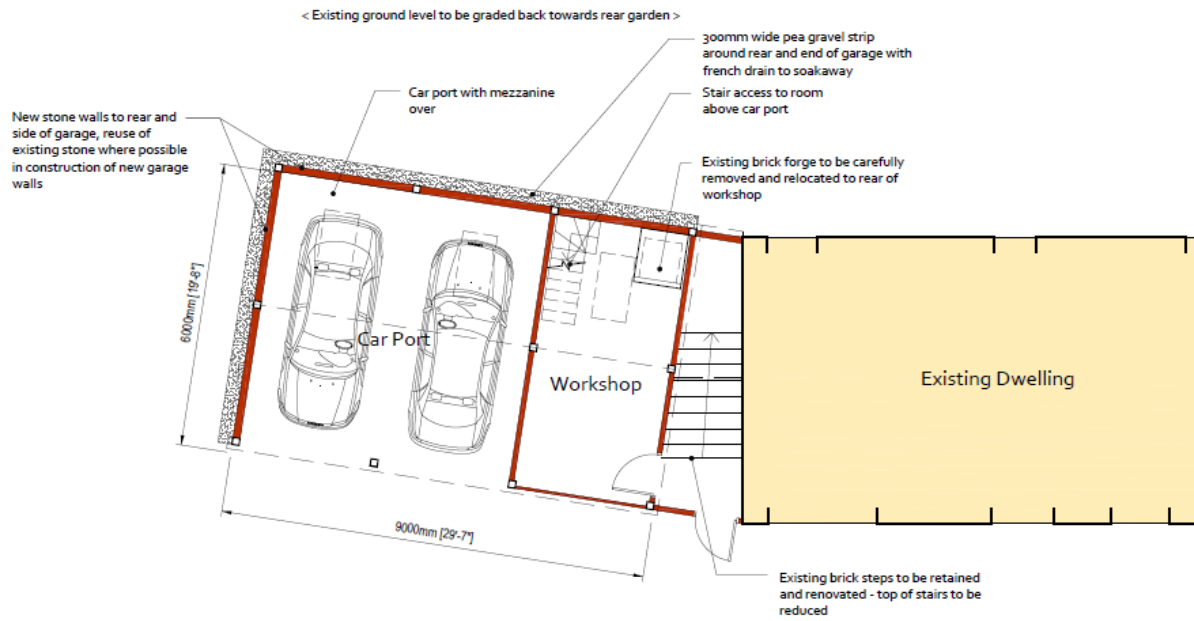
site proposed site plan showing the area of gravel drainage around the rear and side of the garage.
